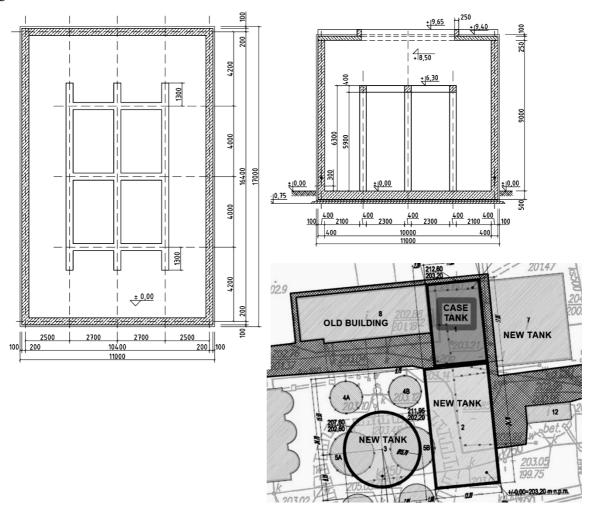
Tank plan and cross section. Site Development Plan (right bottom)
